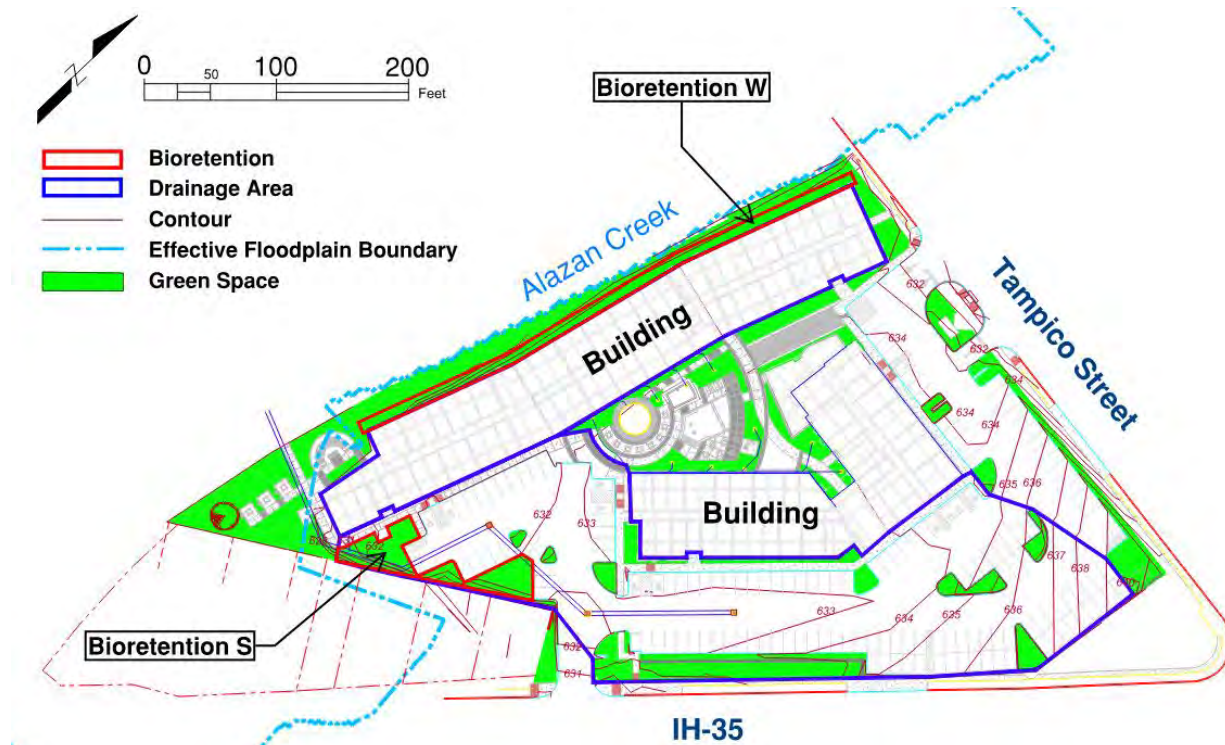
Proposed BMP Layout on Subbasin 420 Site
